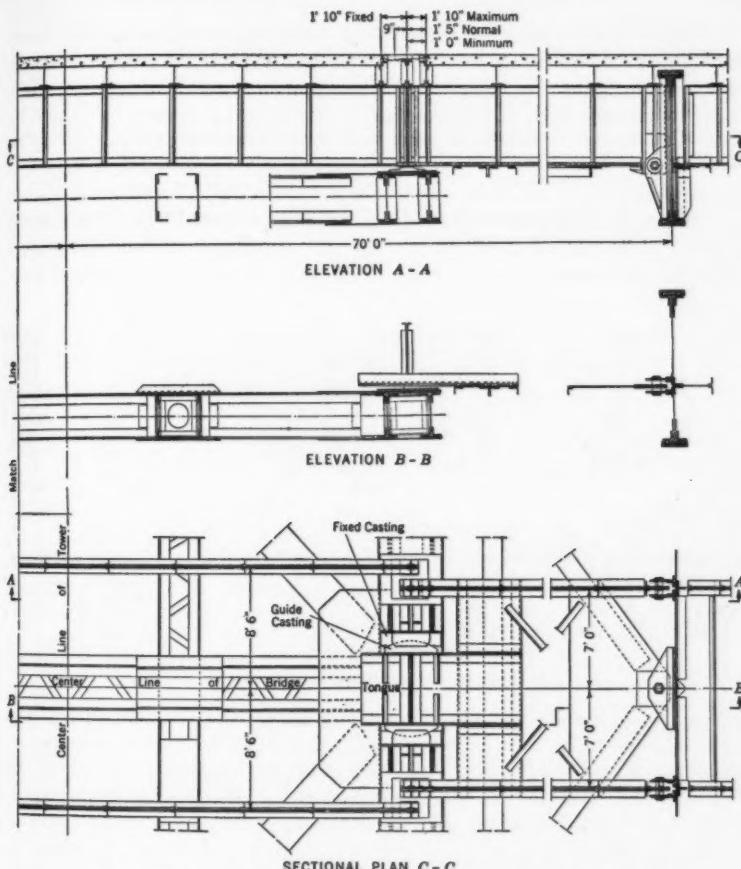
FLOOR EXPANSION DETAILS AT TOWER, SIDE SPAN.
